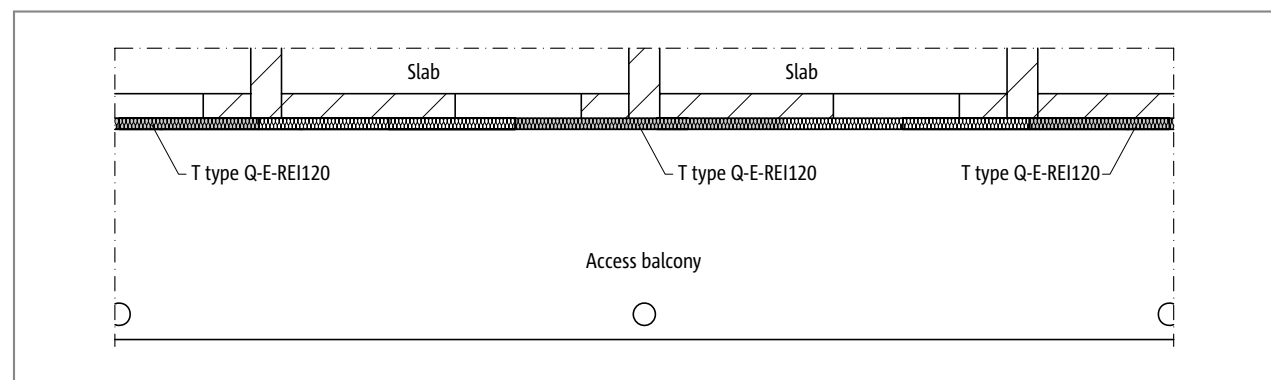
Schöck Isokorb® T type Q-E-REI120: Room-closing passageway walk
